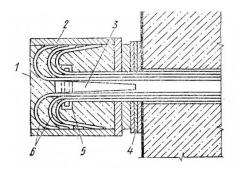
Anchor barrel type: of tendon in anchor: 2 -steel welded barrel with welded on bottom; 3 - conical steel bar; 4 – steel gasket; 5 – ring; 6 – hooks at the ends of wires
